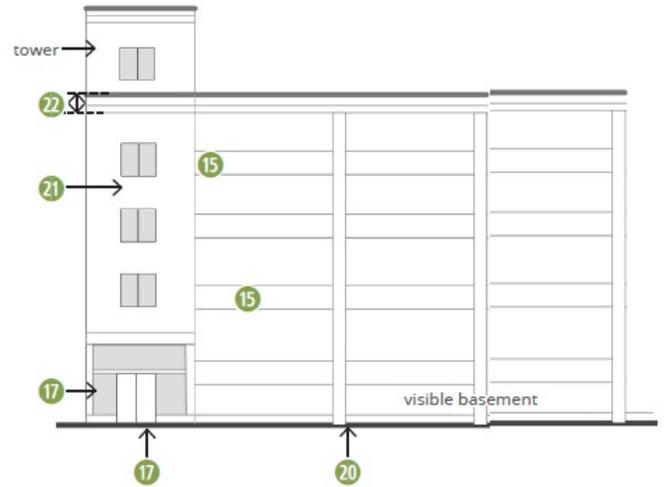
D. Parking Structure: Facade Requirements.
